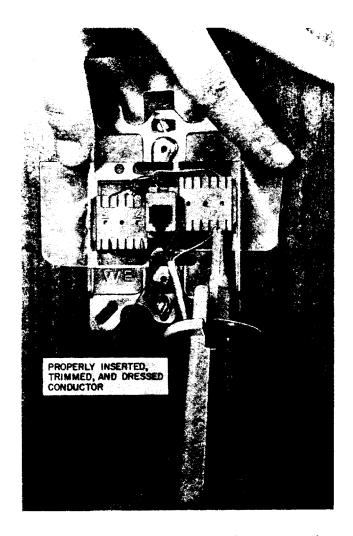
Terminating Wire With Lead Insertion Tool in 630A4 Connecting Block
